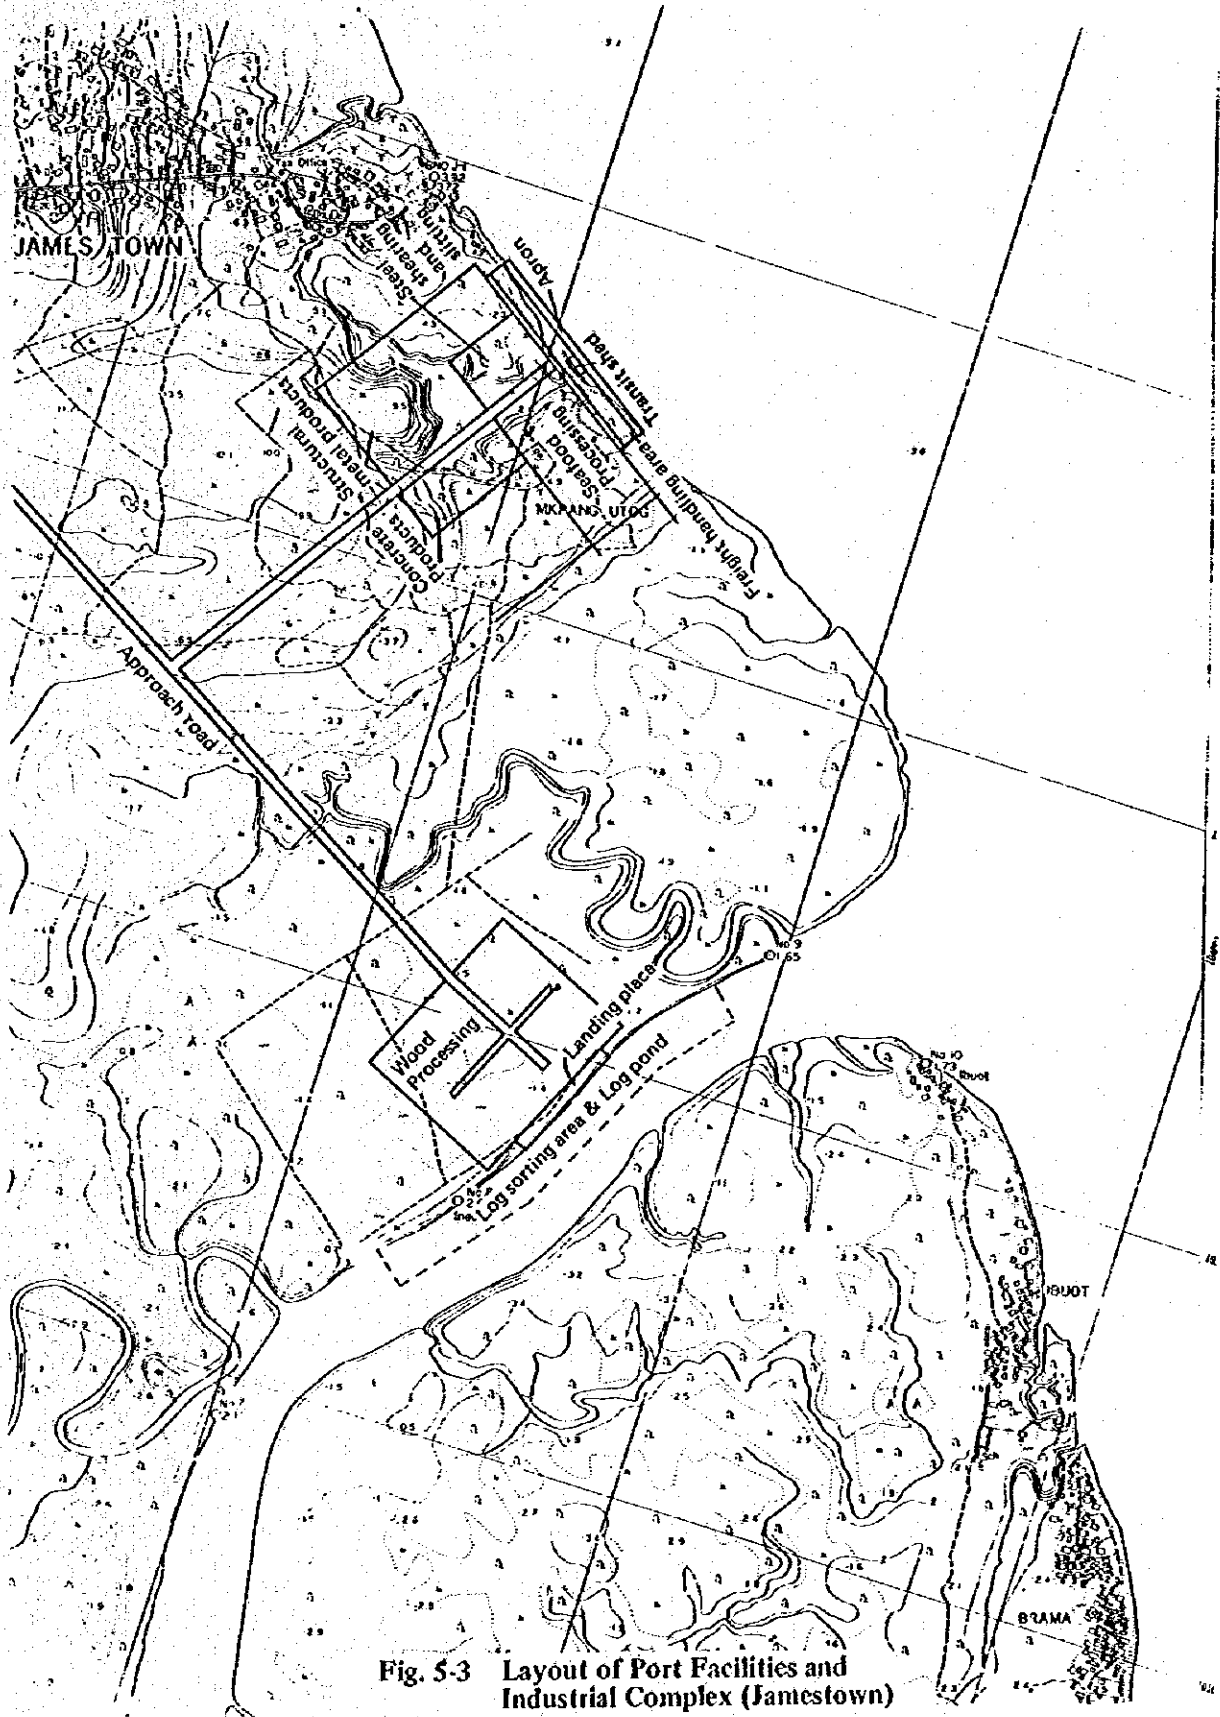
Layout of Port Facilities and Industrial Complex (Jamestown)
